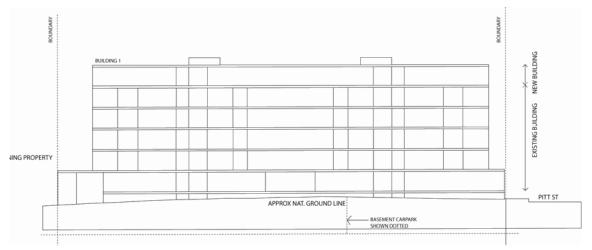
Approved Concept Plan- Building 1 Northern Elevation
